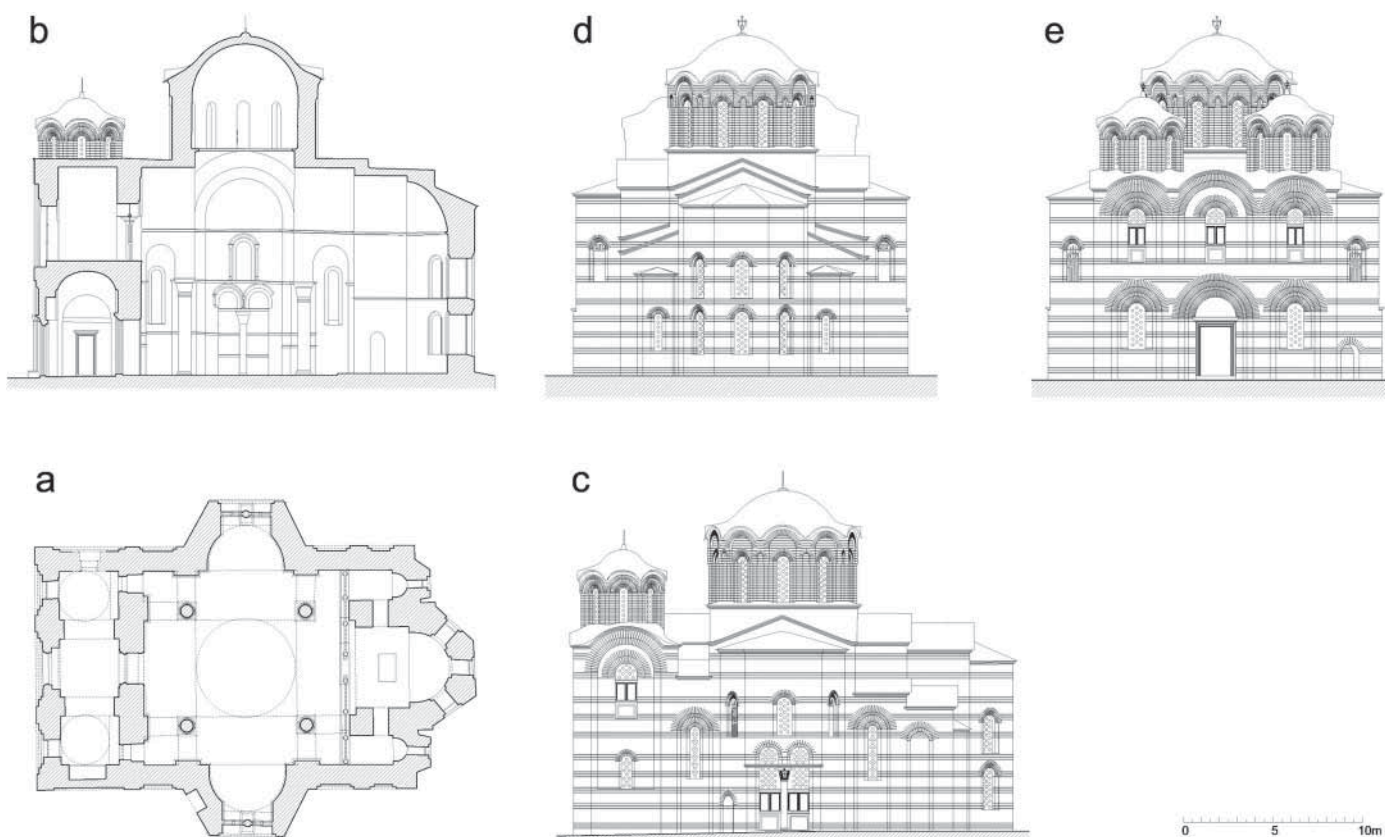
Vatopedi Monastery. Katholikon. Reconstruction. a. Plan, b. Longitudinal section, c. South elevation, d. Eastern elevation, e. Western elevation (S. Mamaloukos)
